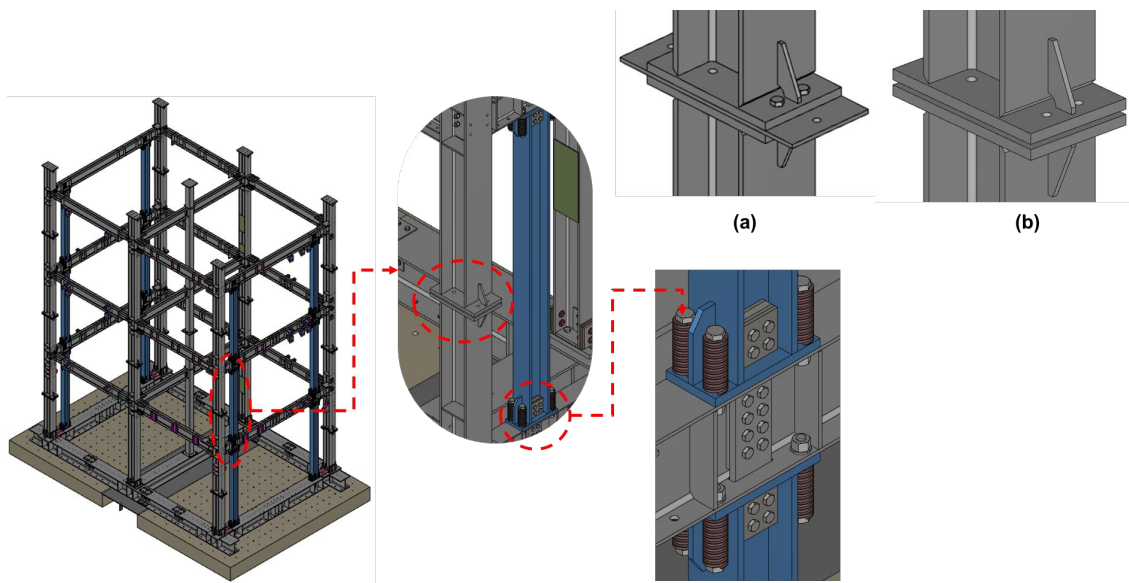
Rocking Column System (a) Prior to and (b) After Installation of Rocking Column
